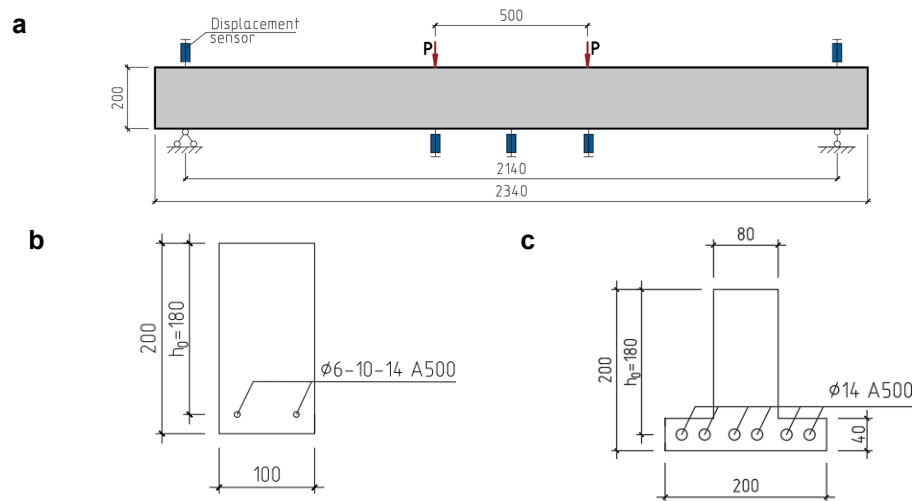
Side view of the beams, their loading scheme (a), cross-sections of rectangular (b), and T-shaped beams (c).
